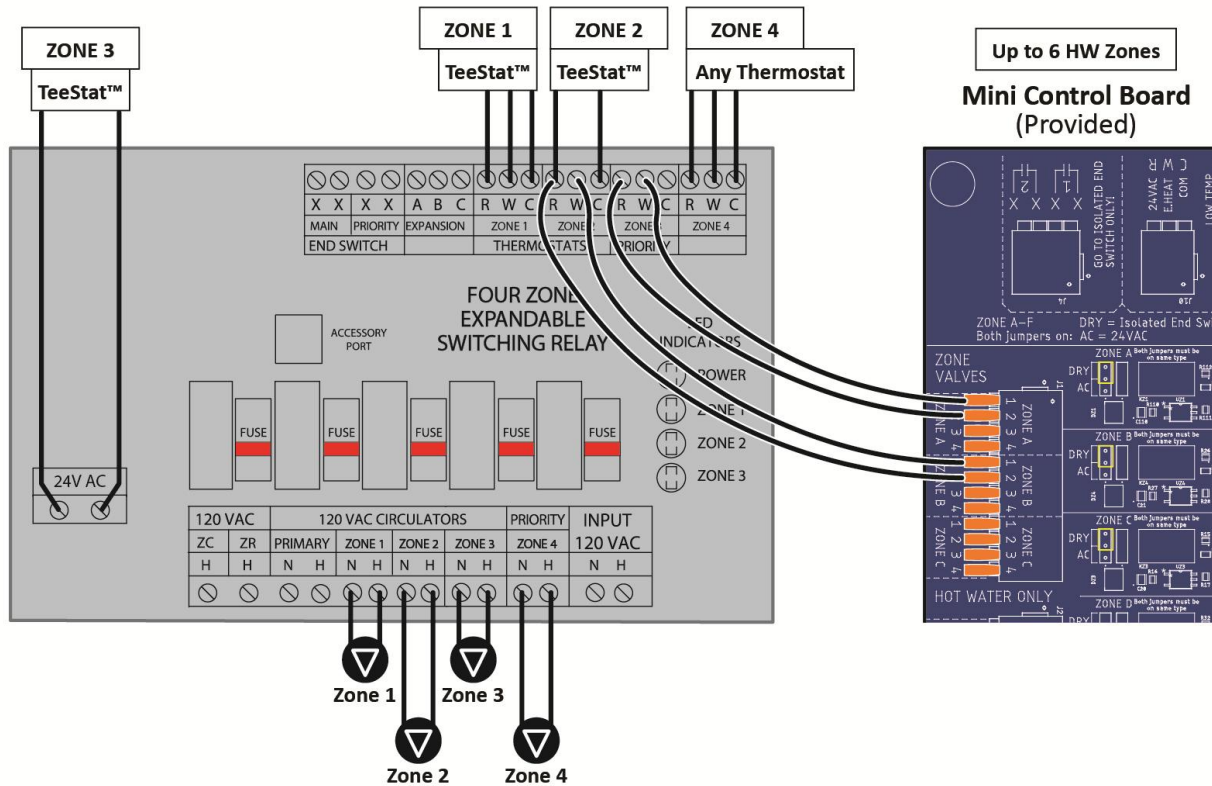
Wiring options for thermostats with zone switching relay board and mini control board
